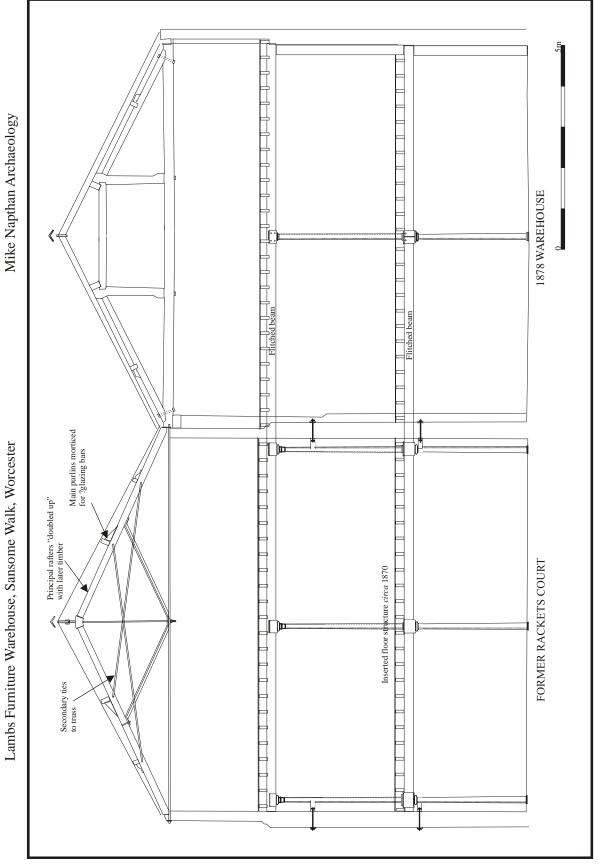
Lambs Furniture Repository, Sansome Walk, internal elevation D-D (northern internal elevation of rackets court)
